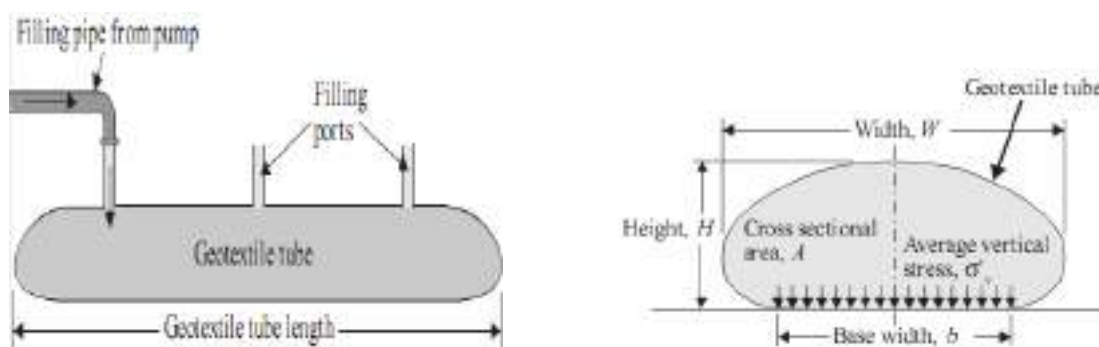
Typical Components of a geotube (Lawson CR 2008)
